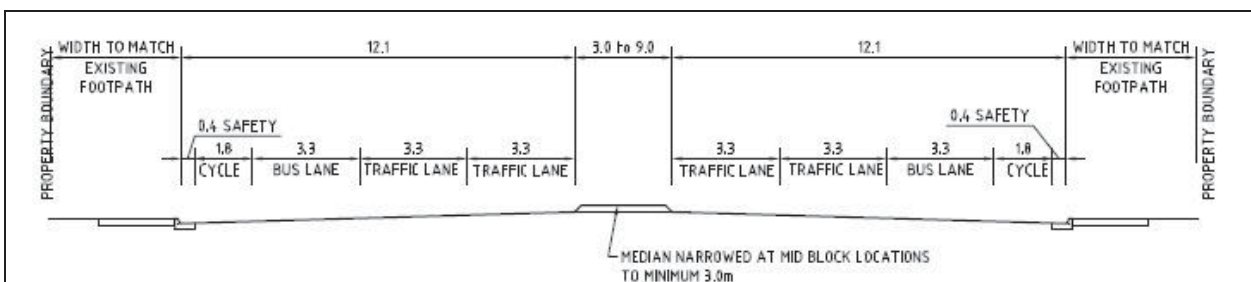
Nicklin Way typical cross-section without on-road parking
